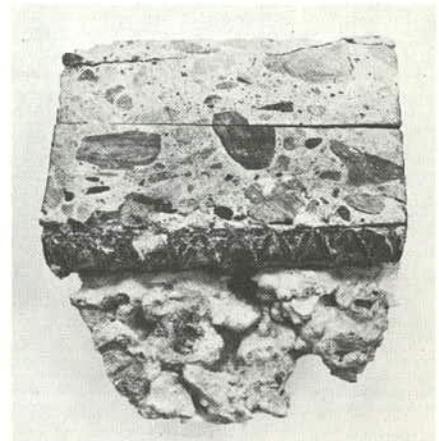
Voids under reinforcing bar caused by poor consolidation of concrete (38).
